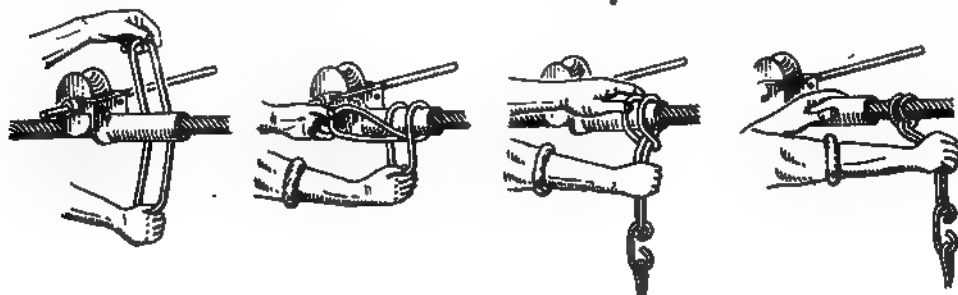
Showing Method of Attaching Sacks to the Cable.
